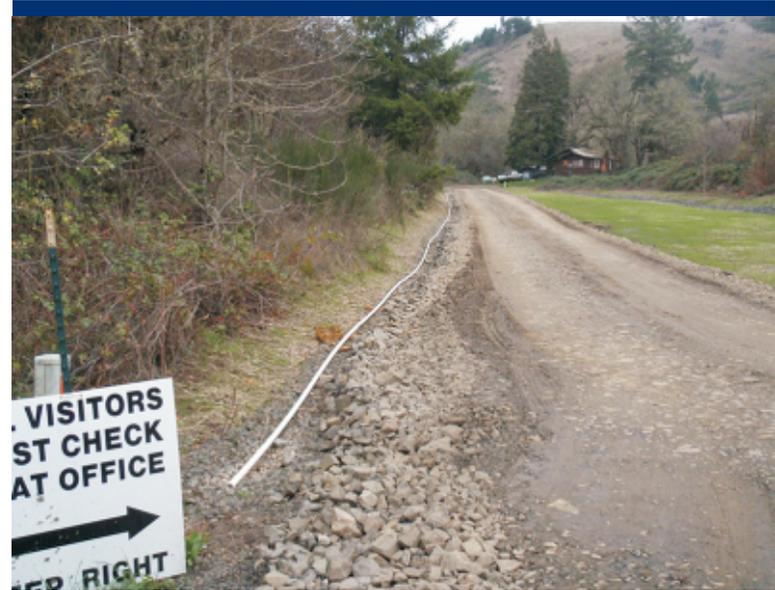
Road leading past Area 4 with water line temporarily exposed along the north side of the road.
